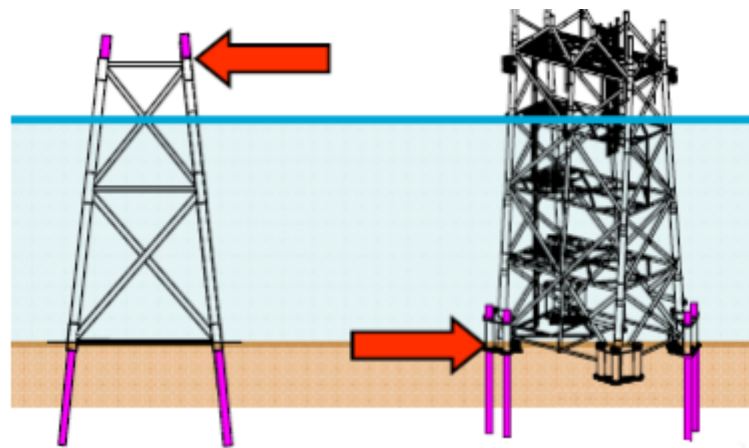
A typical schematic example of a jacket installed using post-piling through the legs or sleeves around the legs of the jacket [14].
